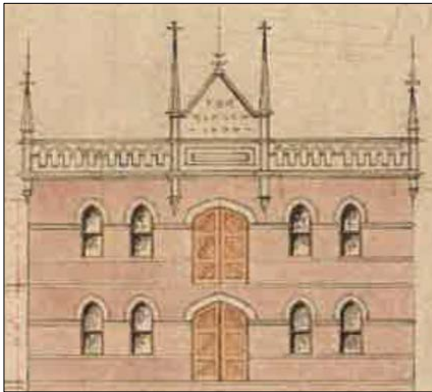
(left) Extract from an 1890 drawing of the Flinders Lane elevation showing a rendered parapet surmounted by triangular pediment with tall finials. It is not known if the parapet was originally built to this detail, noting it is not visible in later photographs.
